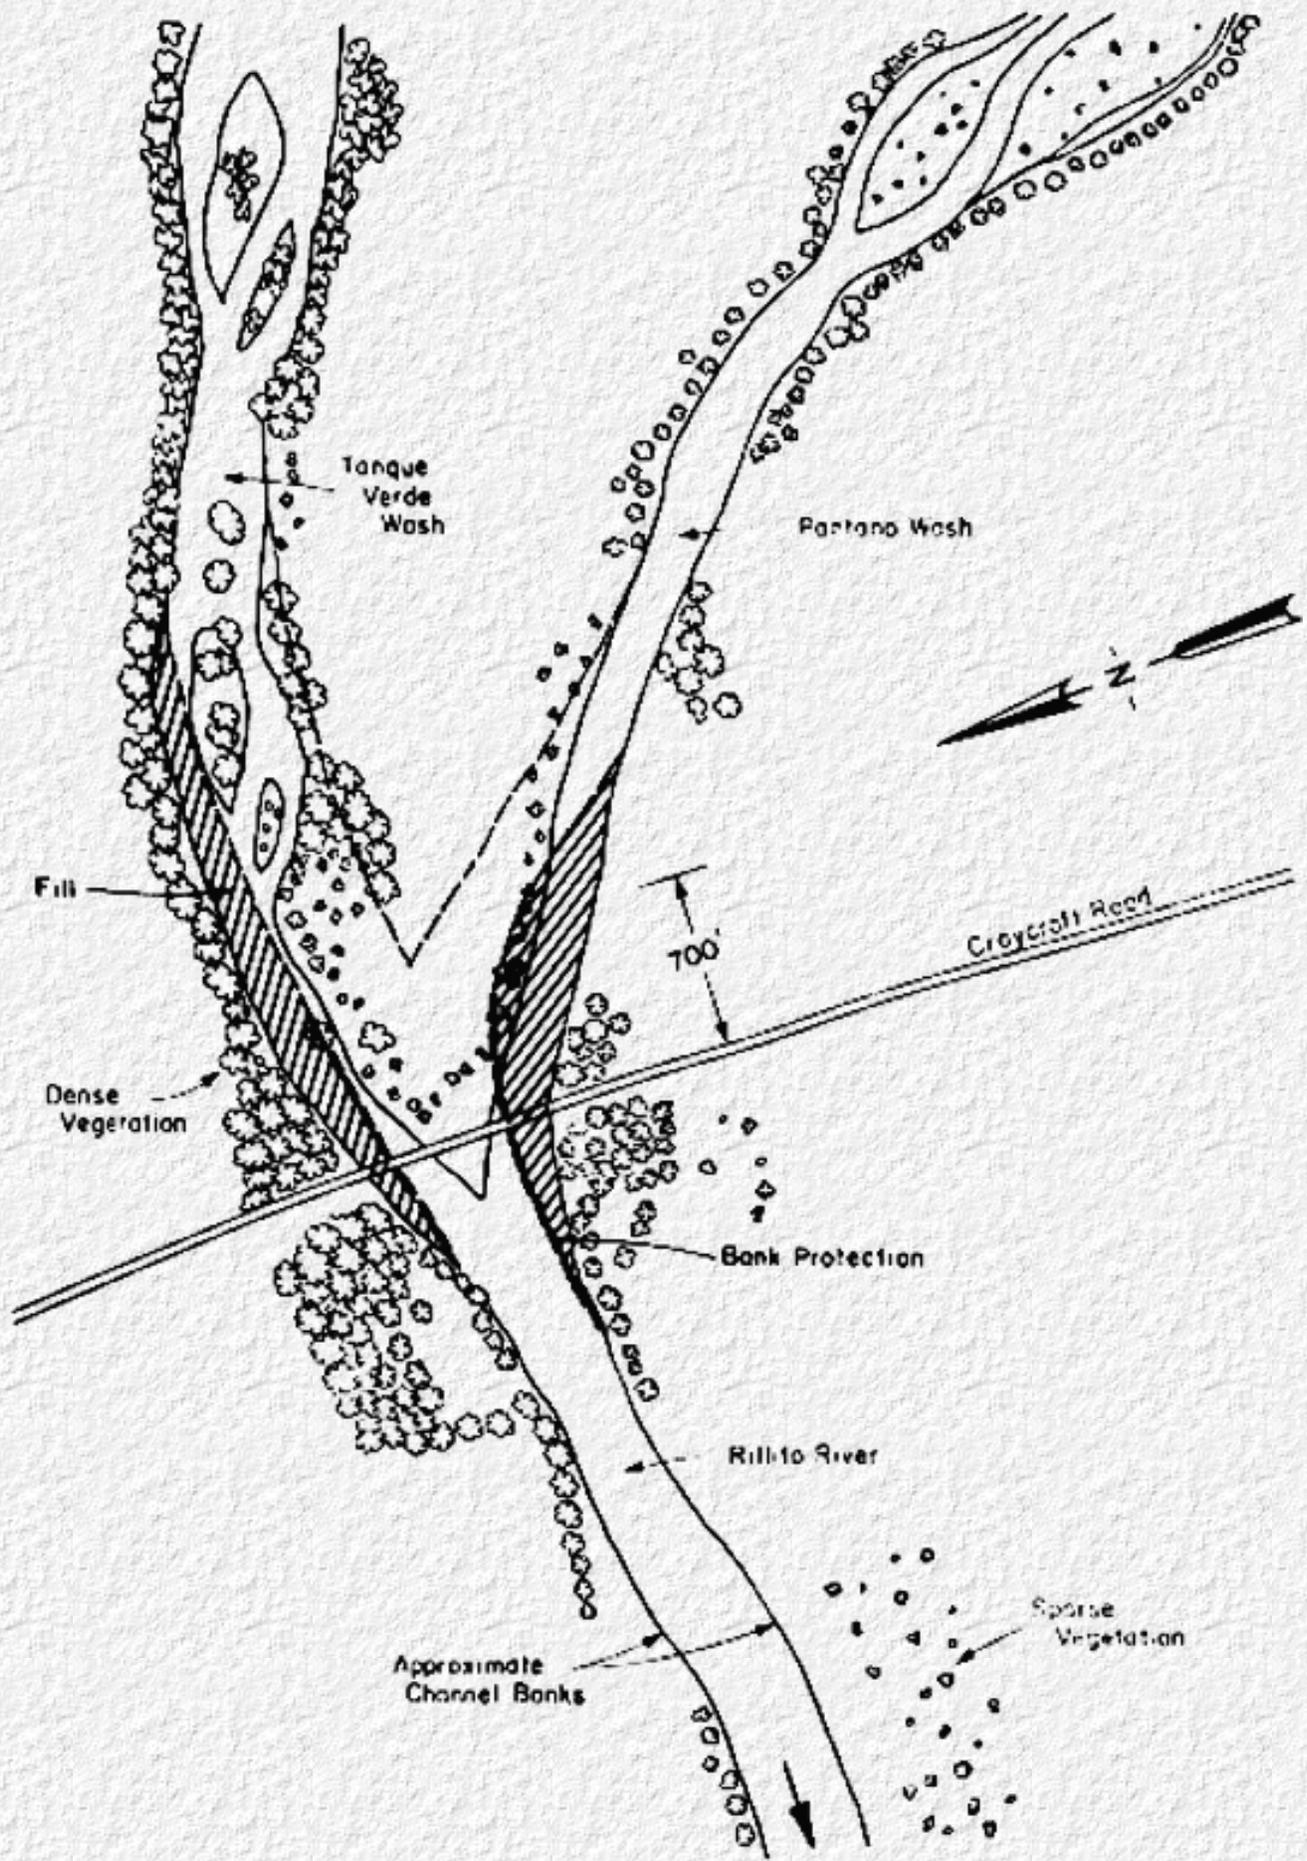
Alternative III for Craycroft Road Bridge Crossing
